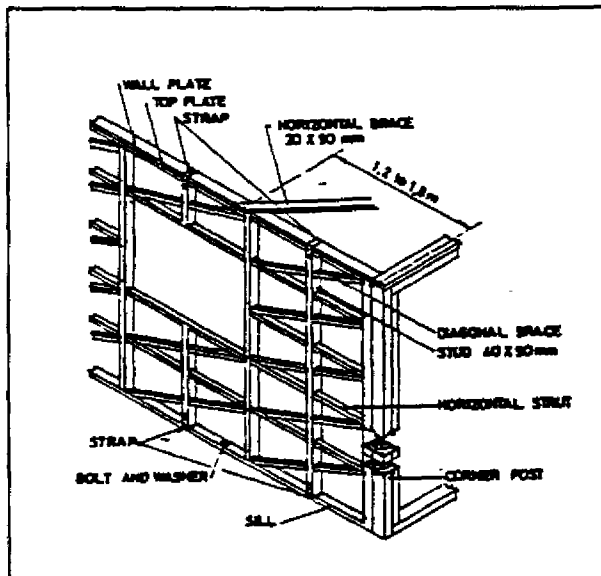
Timber Framing in Stud Wall Construction with Opening in Wall [1].
